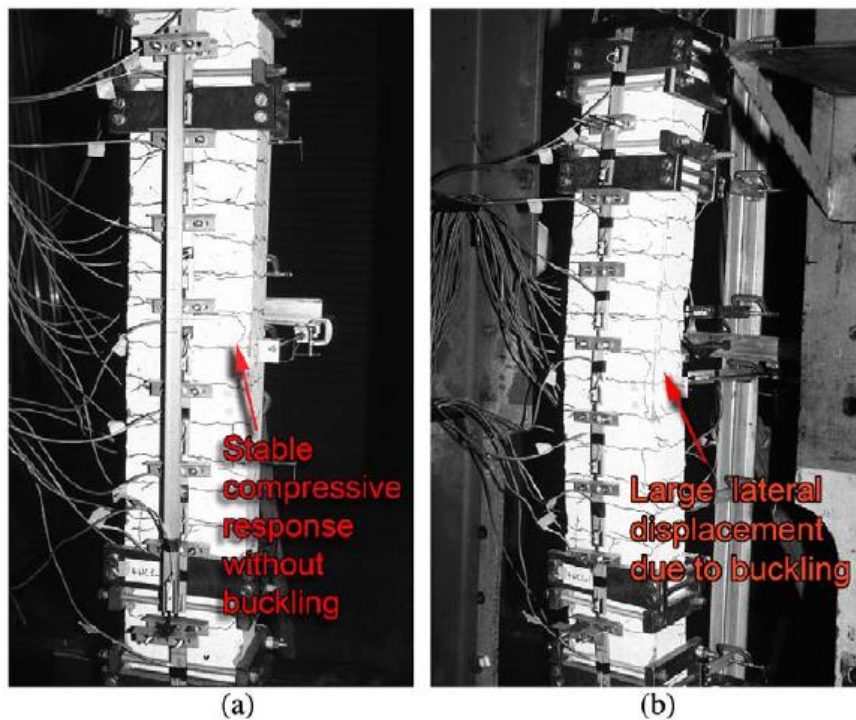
Stability of a reinforced concrete column under tensile/compression cycles:
